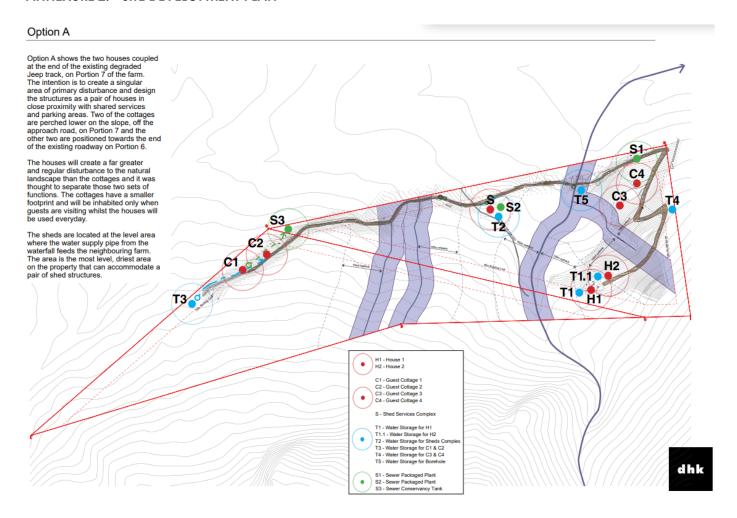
Site plan depicting the proposed development on Portions 6 and 7 of Farm No. 1159, Franschhoek.
